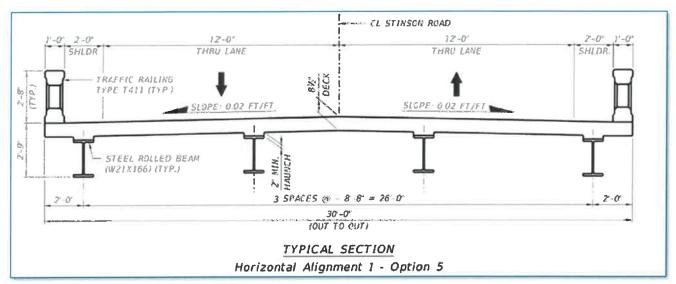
Steel Rolled Beams (W21X166) Typical Section
